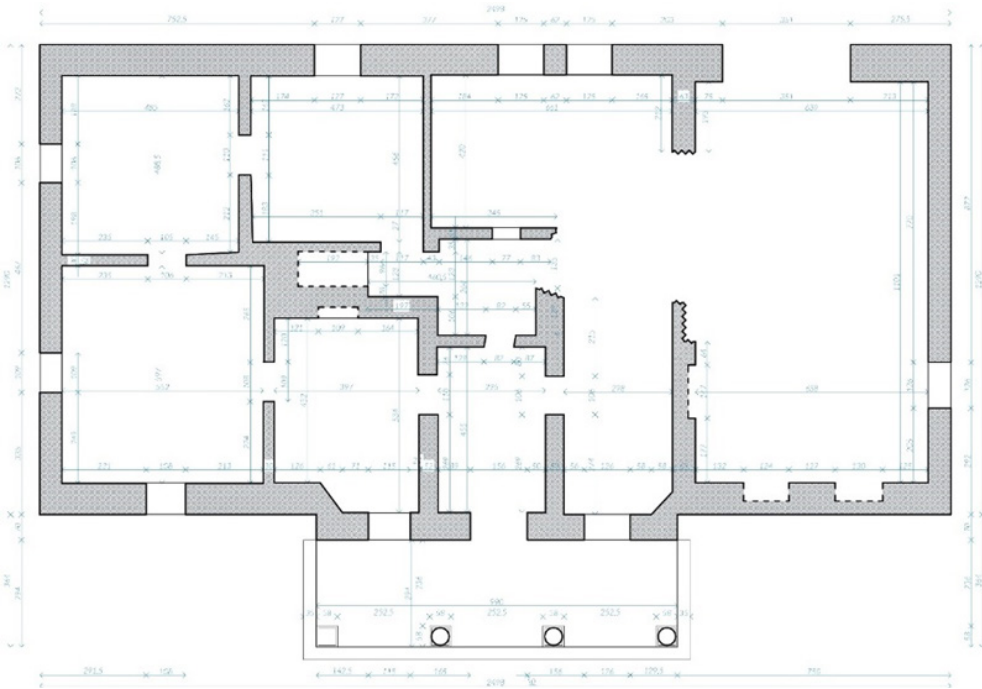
Architectural and structural survey of the manor building. Ground floor plan.* By M. Krupa, D. Kuśnierz-Krupa, Ł. Bednarz, 2021.
